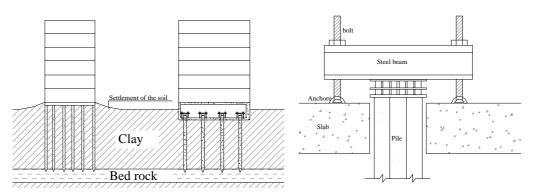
Control piles: (a) global behaviour of the building, with and without control piles, (b) detail of the connection between pile and structure
